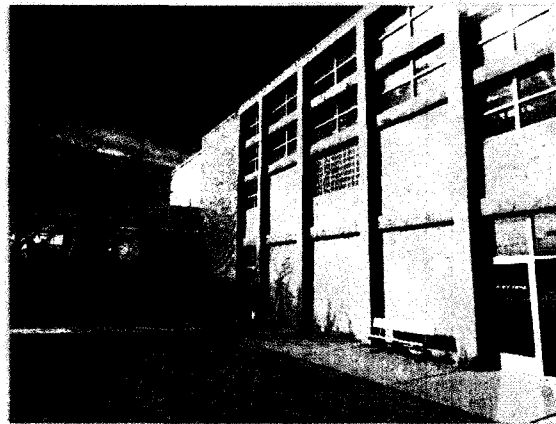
on Page 2 depicts the east wall of the natatorium as of April, 2011 prior to installation of the existing EIFS system. The upper portion of wall shows CMU infill in previous window or possibly louver openings. Photo No. 2 shows the existing condition of the east wall as of February 2018 from a slightly different angle. Photo No. 3 depicts the south wall of the natatorium as of February 2018.
